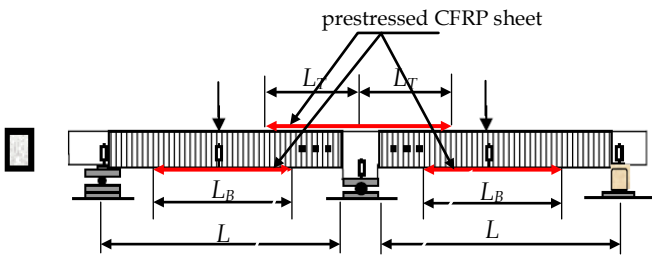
Beam CF4 with added prestressed longitudinal CFRP sheets
